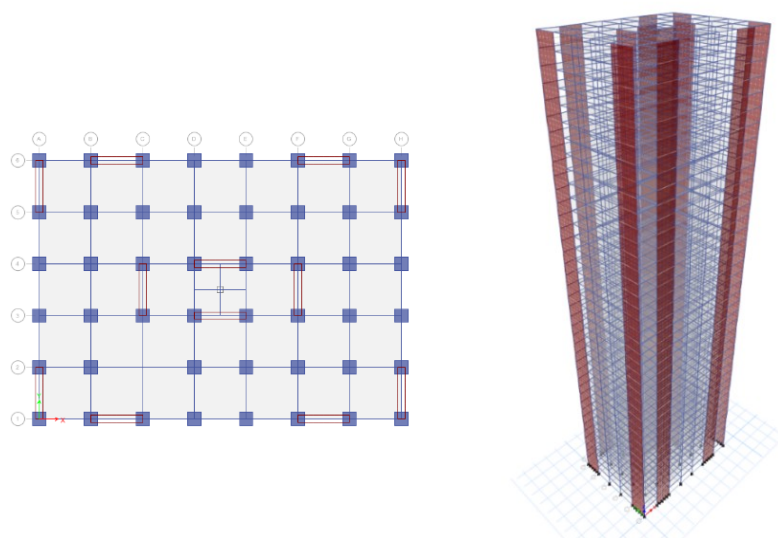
Structure with rectangular reinforced concrete frames – plane and elevation
